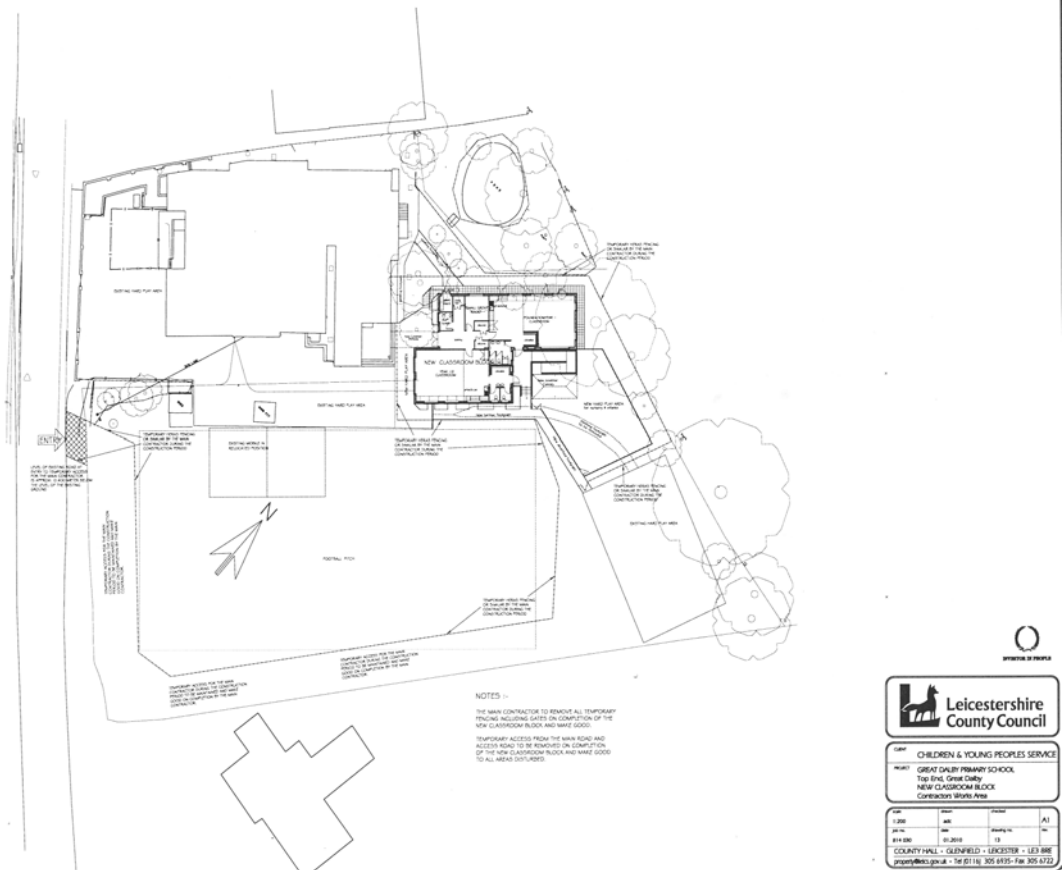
Plan of the proposed development showing the route of the temporary access road.
